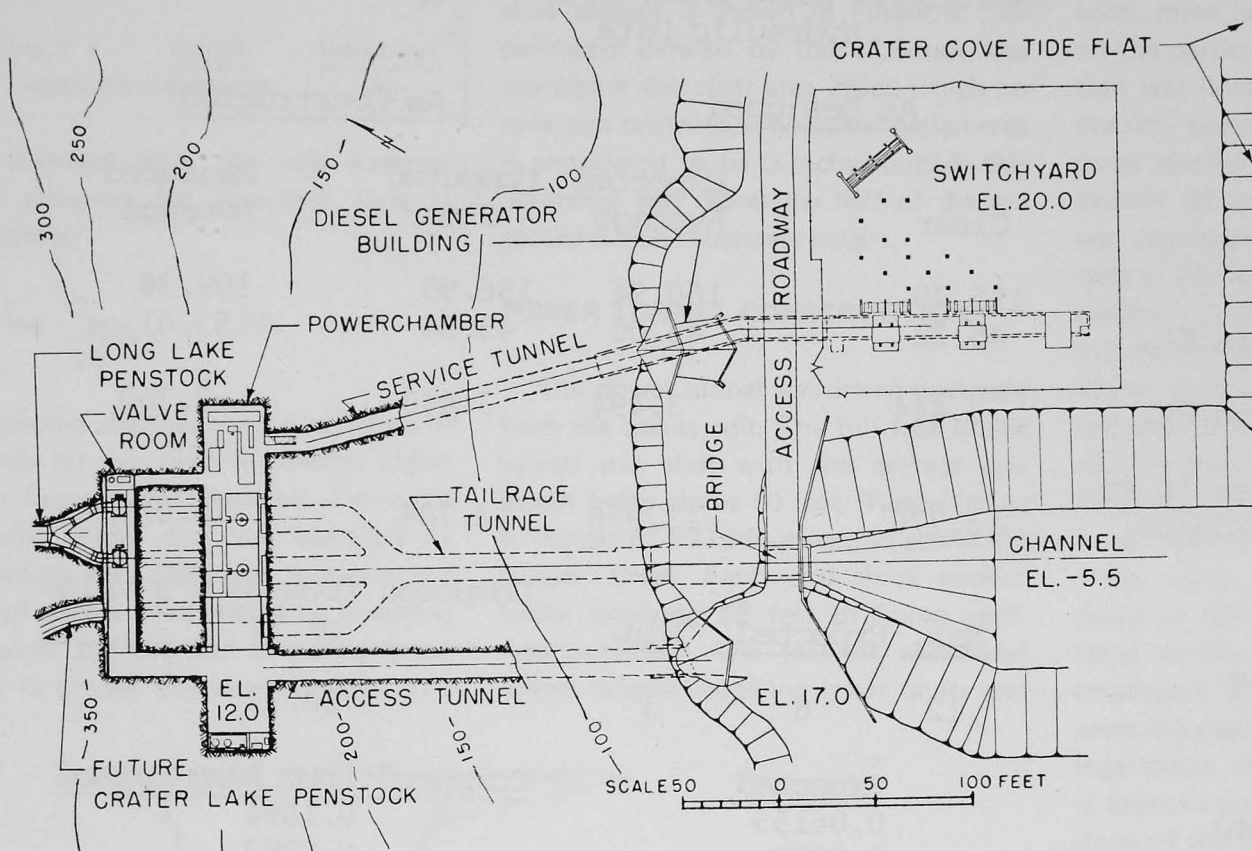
GENERAL LAYOUT OF POWERHOUSE AND SWITCHYARD AREA
